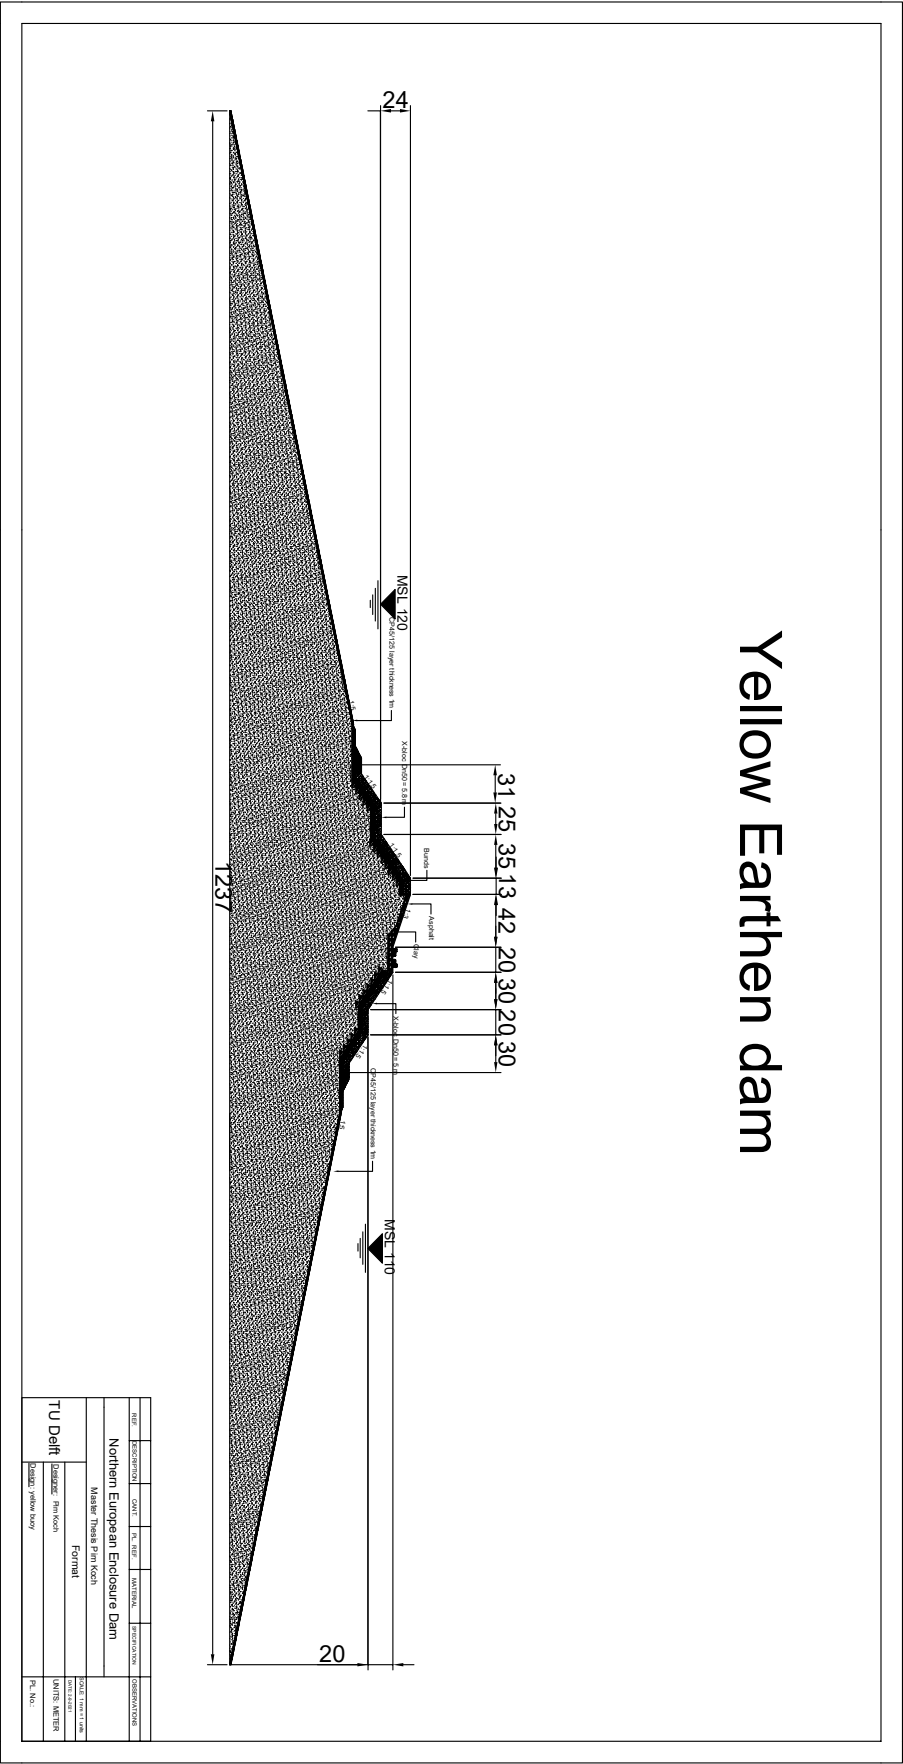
Autocad Earthen Yellow Caisson Dam.
